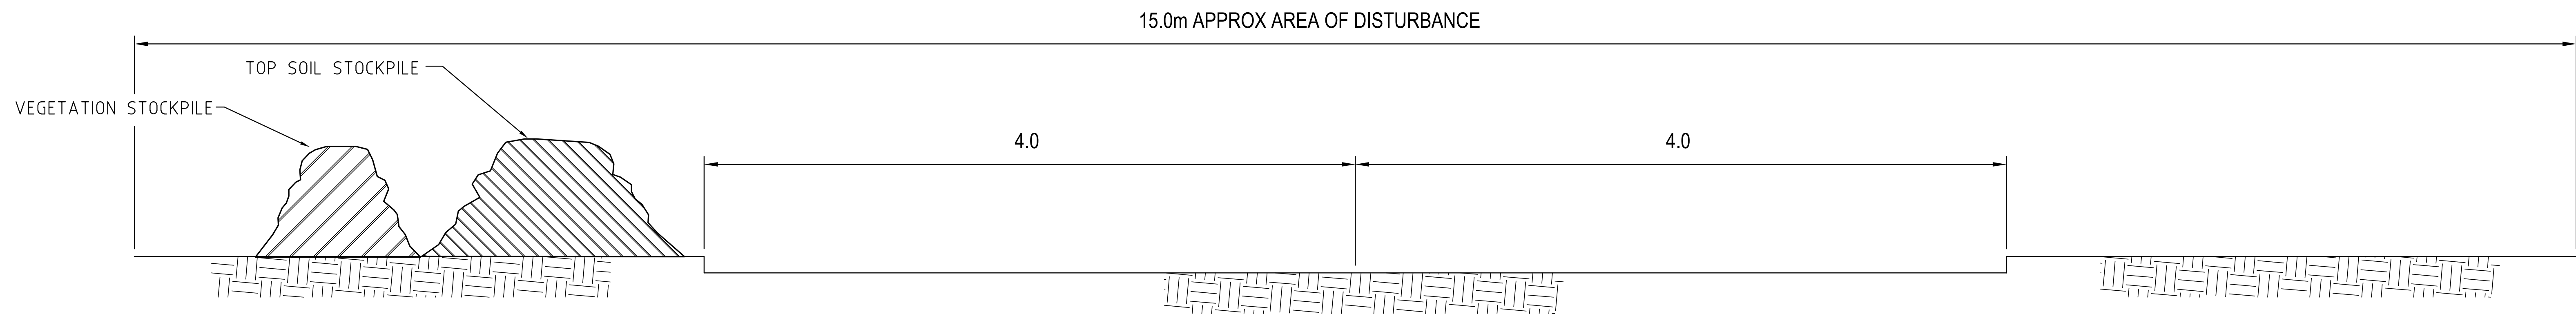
TYPICAL UNSHEETED (NATURAL SURFACE) ACCESS TRACK LAYOUT
